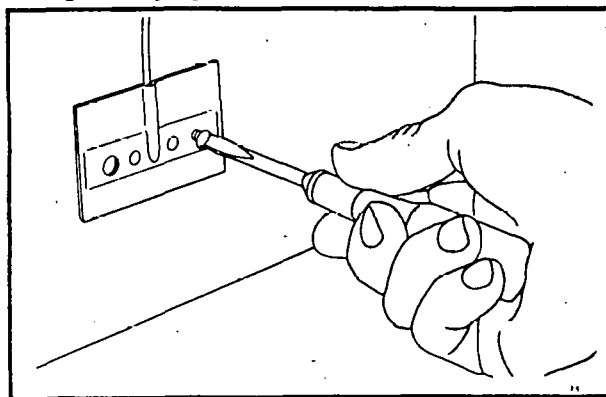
FASTENING HOLDER TO DUCT WALL.
